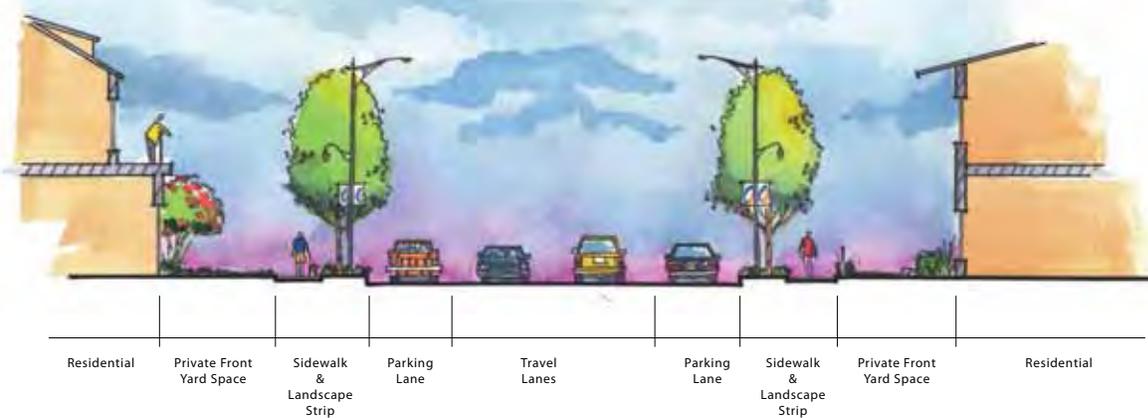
City Limits Sub-Area/Roadway Cross Section
